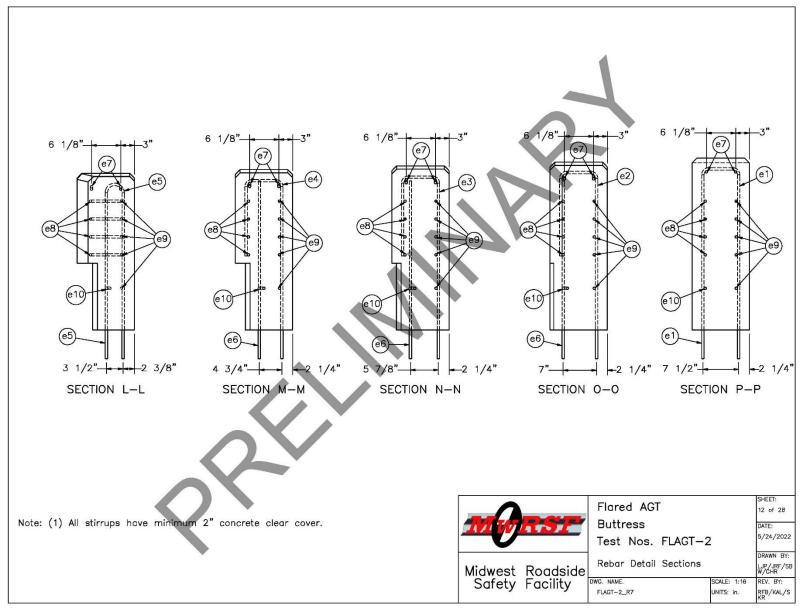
Buttress Rebar Detail Sections, Test No. FLAGT-2
